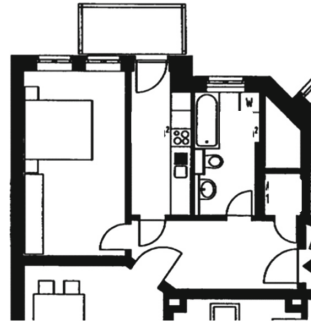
Arrangement of balconies in the building design with access from the kitchen (image by the author).
